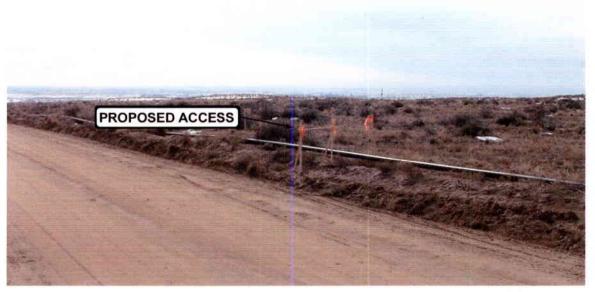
PHOTO: VIEW FOM BEGINNING OF PROPOSED ACCESS
